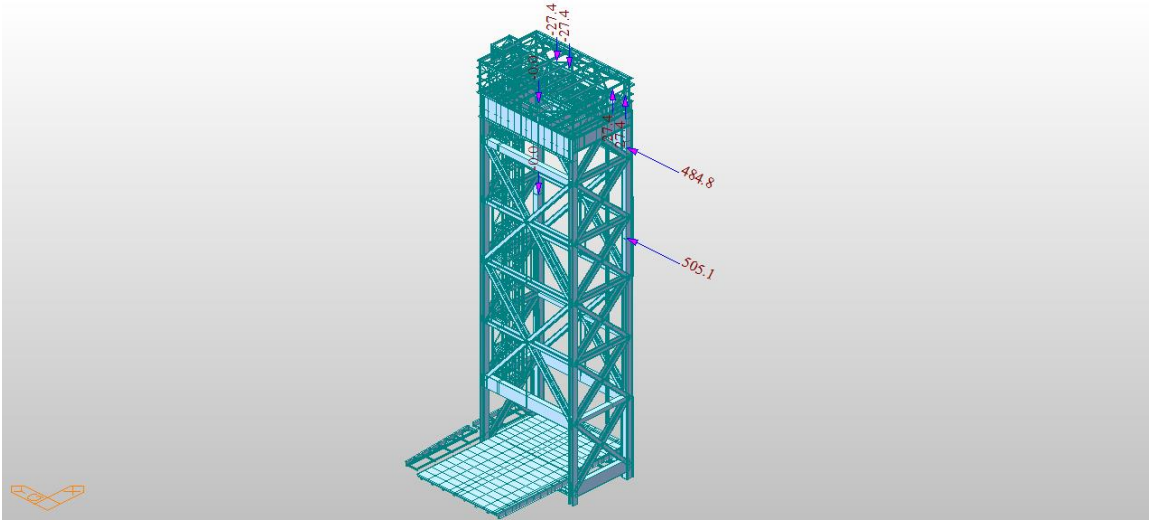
Wind Load Horizontal 1 (East to West) – Bridge
